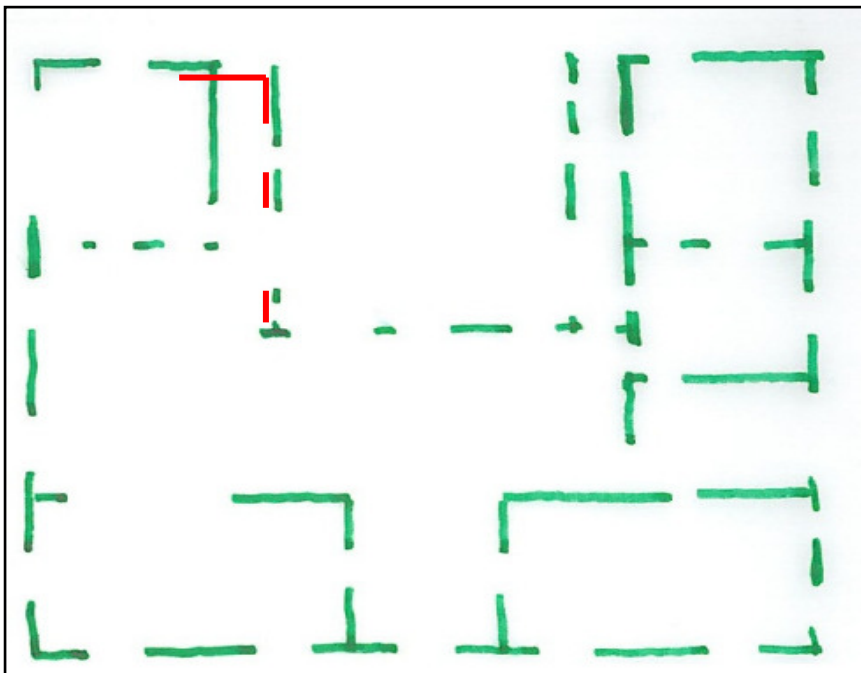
View of the remaining sections of original walling as provided by May (2013). The red sections were sampled during this study.
